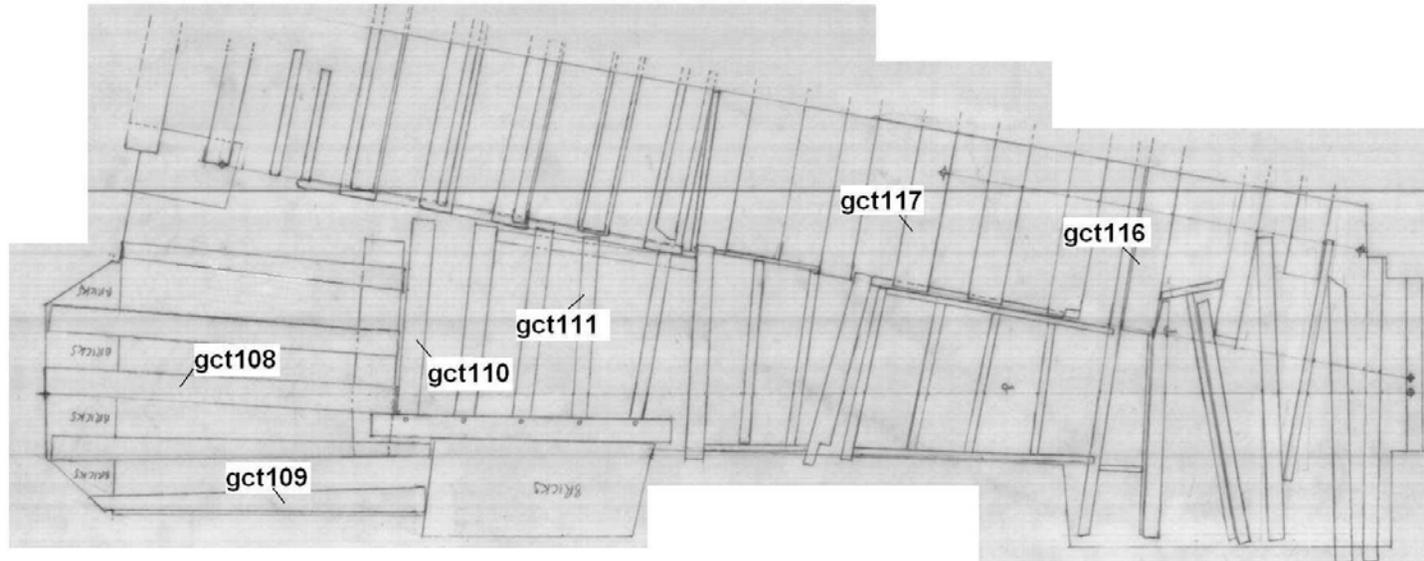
Floorplan of the lower floor to room F6, showing timbers sampled for dendrochronology
